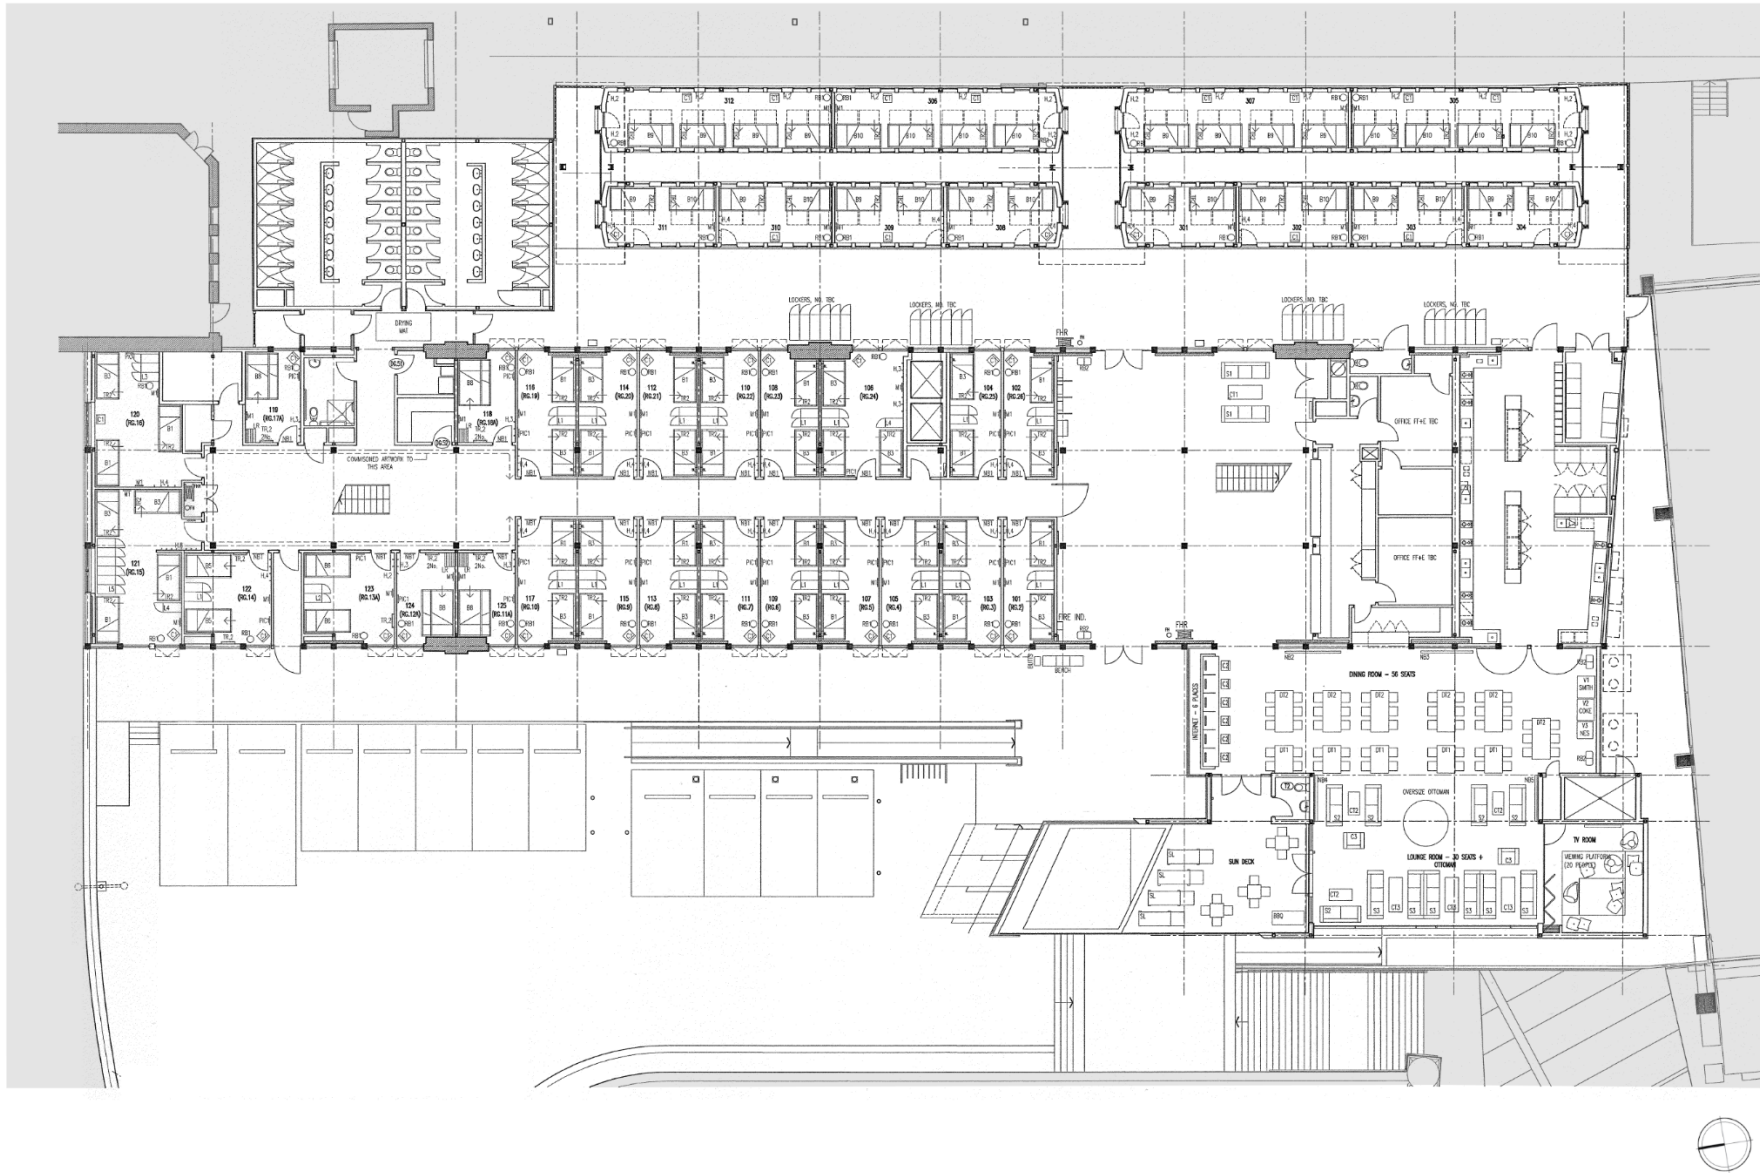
Ground Floor Plan (grey area is not included as part of the subject site)
